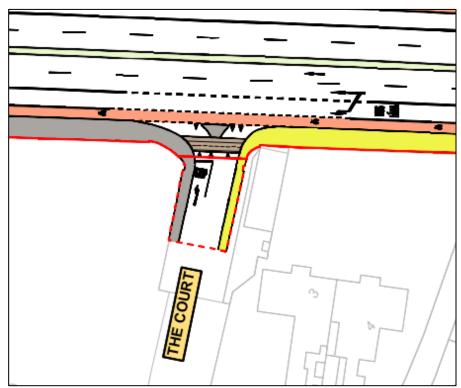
Extract from Landscaping General Arrangement Drawings (Sheet 09)
